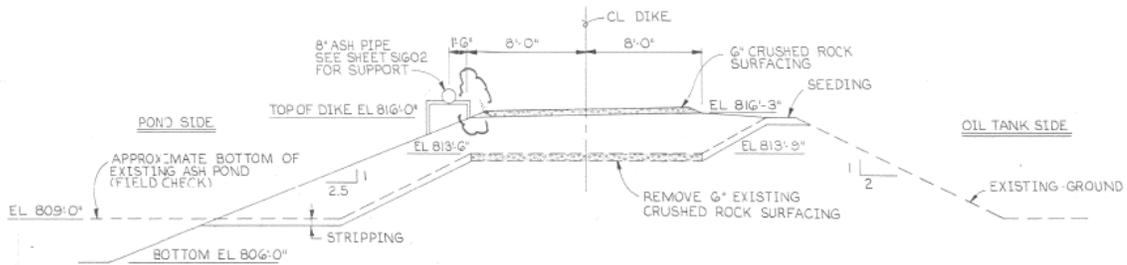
Typical Embankment Cross-Section of East Embankment, (Black & Veatch, 1977)
